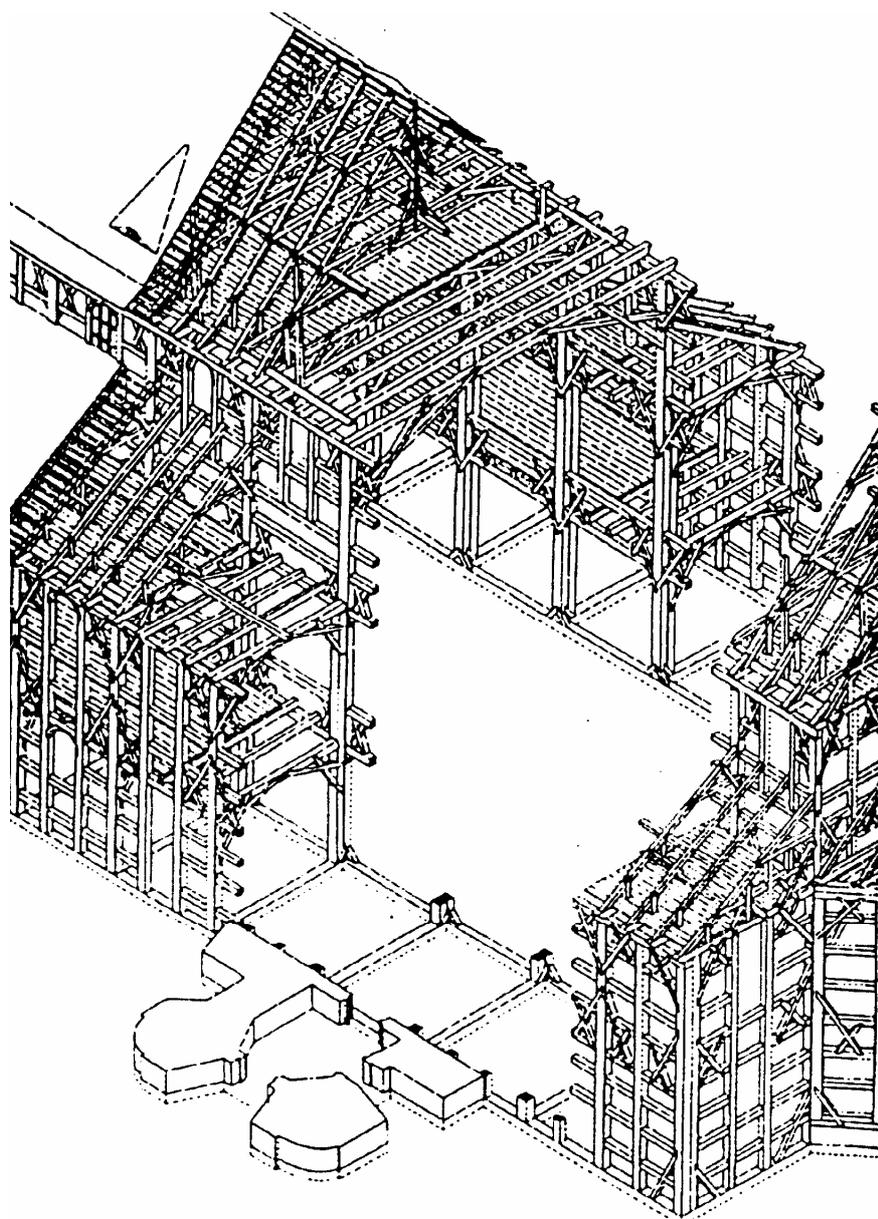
Axonometric view of the fragment of church skeletal construction from southern side.
